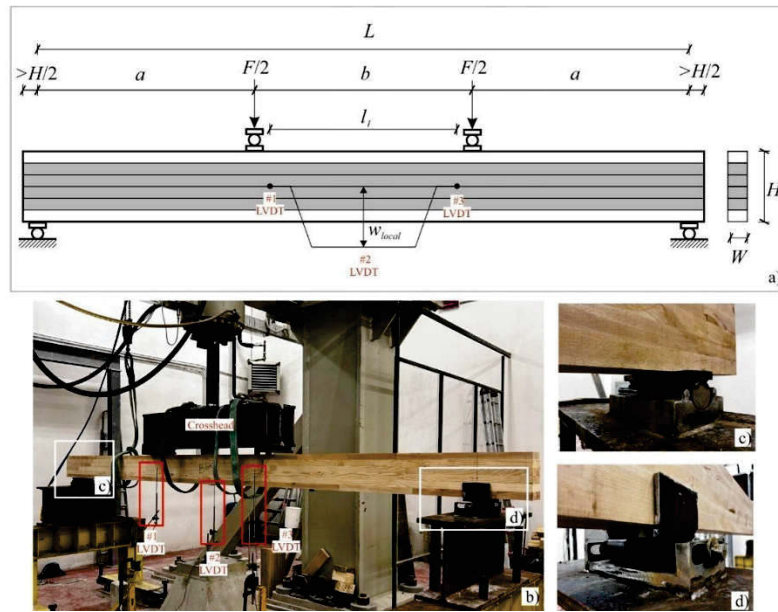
a) Geometrical representation of the setup; b) Test setup; c) Hinge detail; d) Carriage 157 detail. W_{local} = local deformation; W = width; H = height; L = test span (18H for bending and 9 H for shear tests); $a = b = 6 H$ for bending and 3 H for shear tests; l_1 = distance for the measure of the local deformation = 5 H; F = load.
